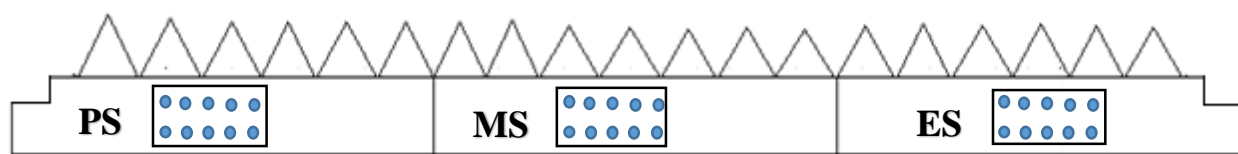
Hammer test rebounding technique taken by the researcher.
